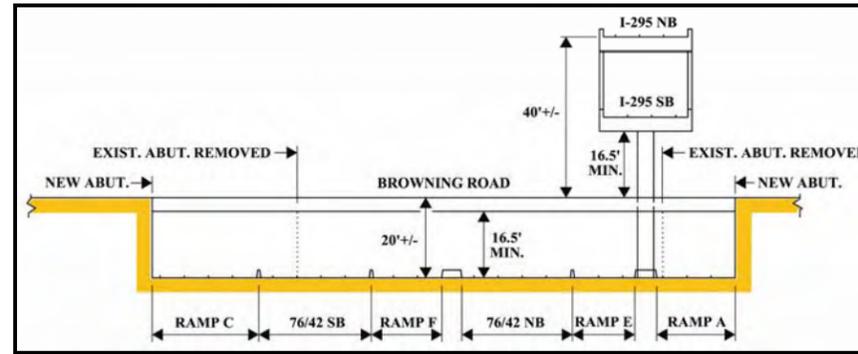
Section A-A at Browning Road (Alternative H1)
